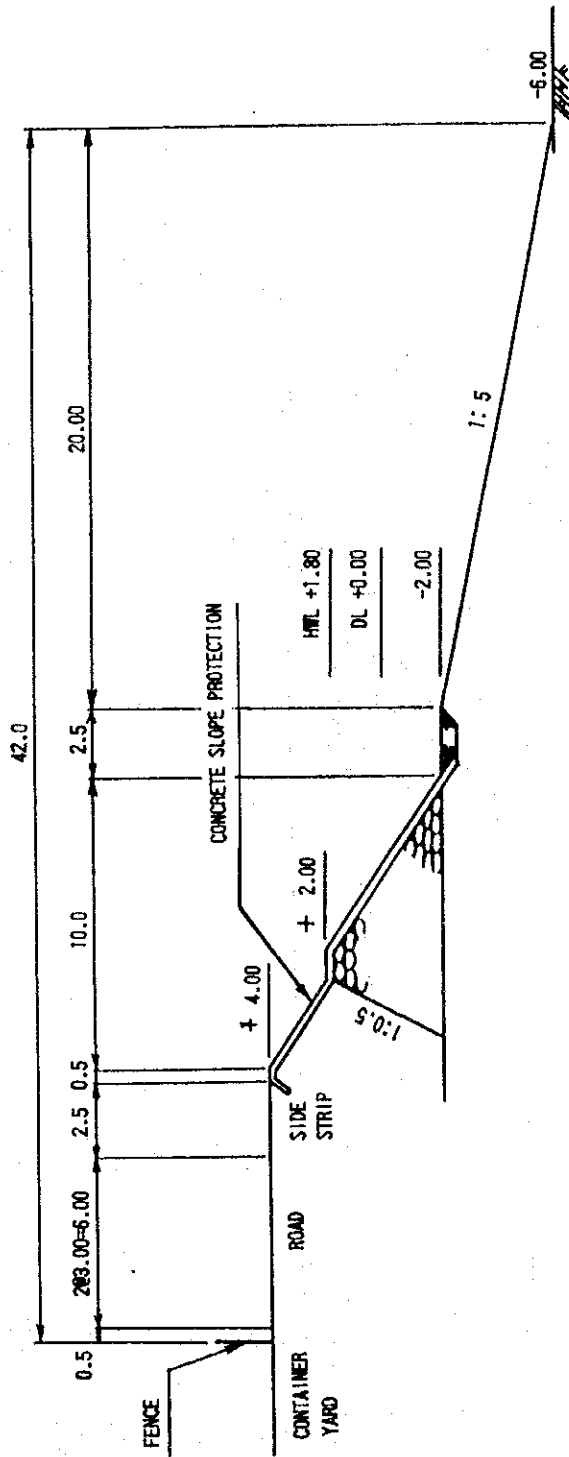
(2) Typical Cross Section of Wharf and Return Wall
